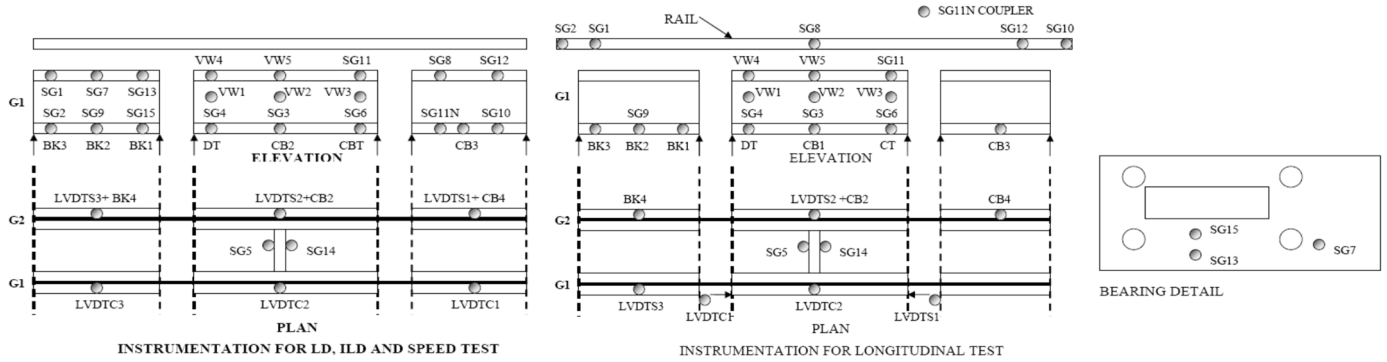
Layout of sensors for Bridge 3 (plan and elevation over 3 spans and bearings) for different tests.
